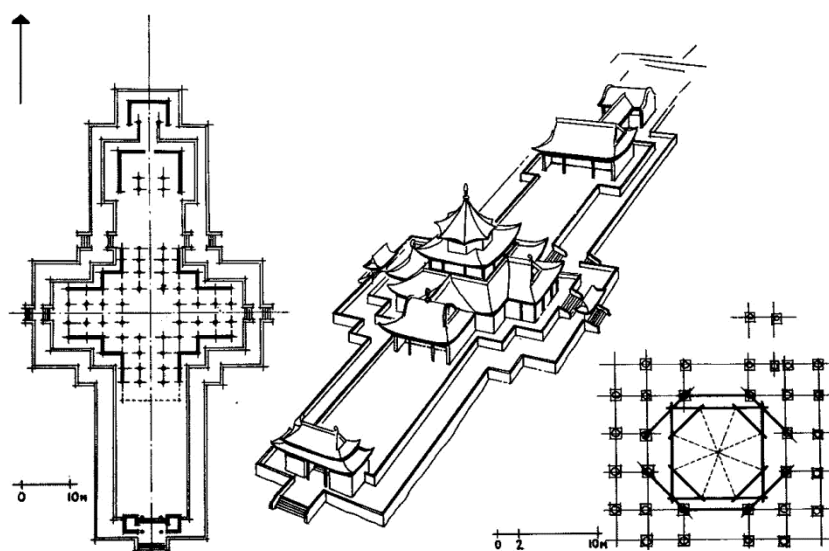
Kondui palace. Reconstruction by architect V. Tkachev
